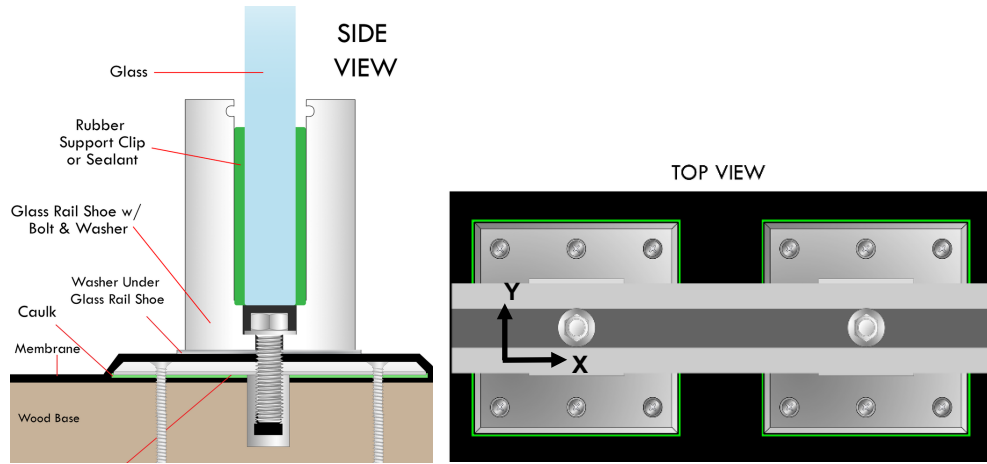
TYPICAL INSTALLATION OF ANCHOR FLANGES
